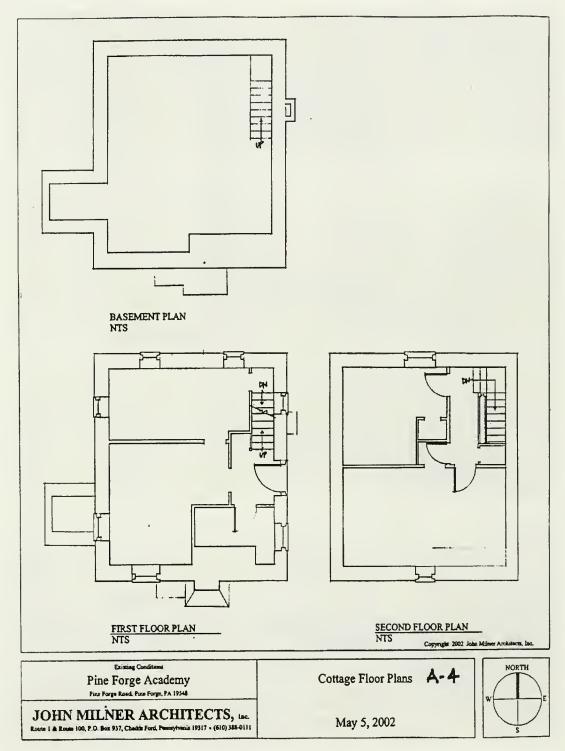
Caretaker's Cottage Floor Plans, 2002
